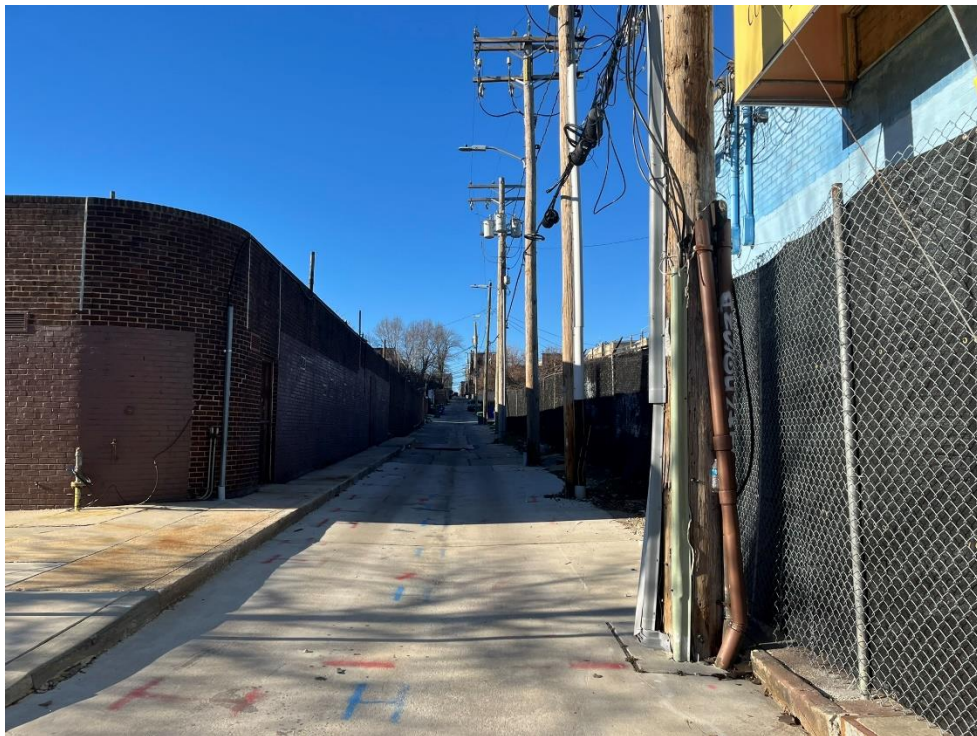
Jordan Street on the site of the Intermediate Ventilation Facility, view looking north.
